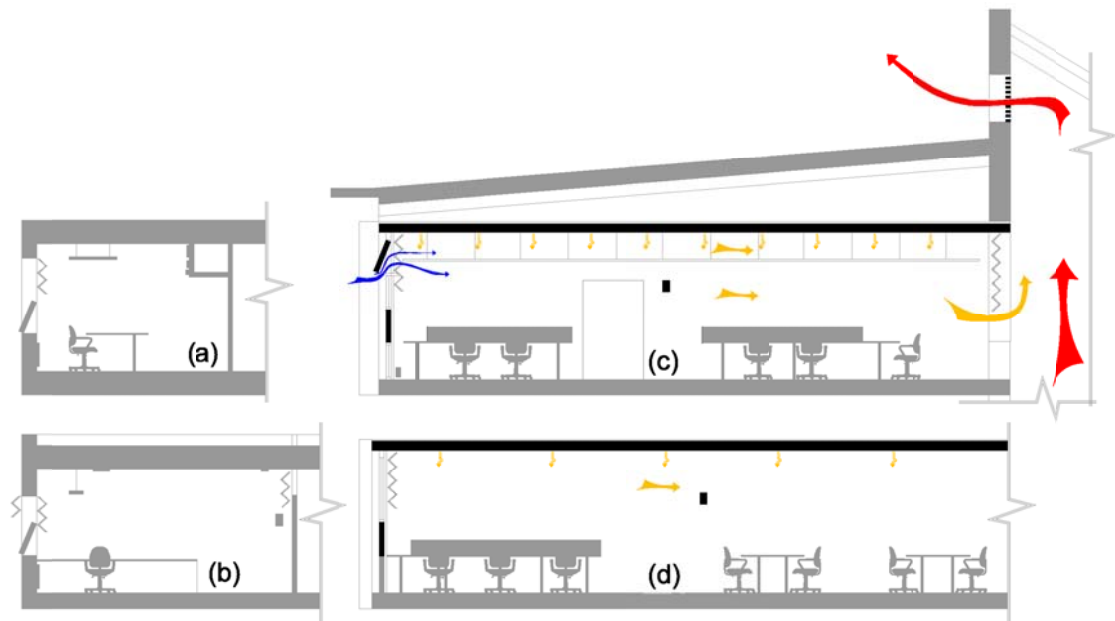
Summer night ventilation sections (a) Building A, (b) Building B, (c) Building C, and (d) Building D
